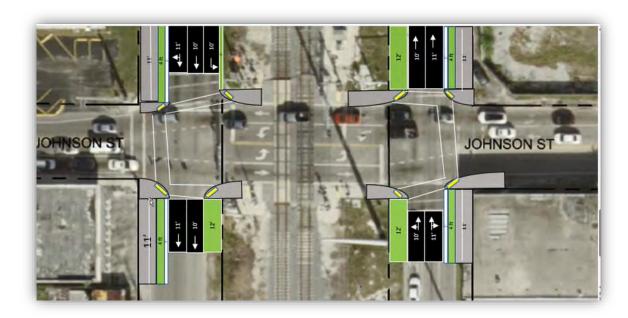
Proposed intersection improvements at the Johnson Street intersection.
